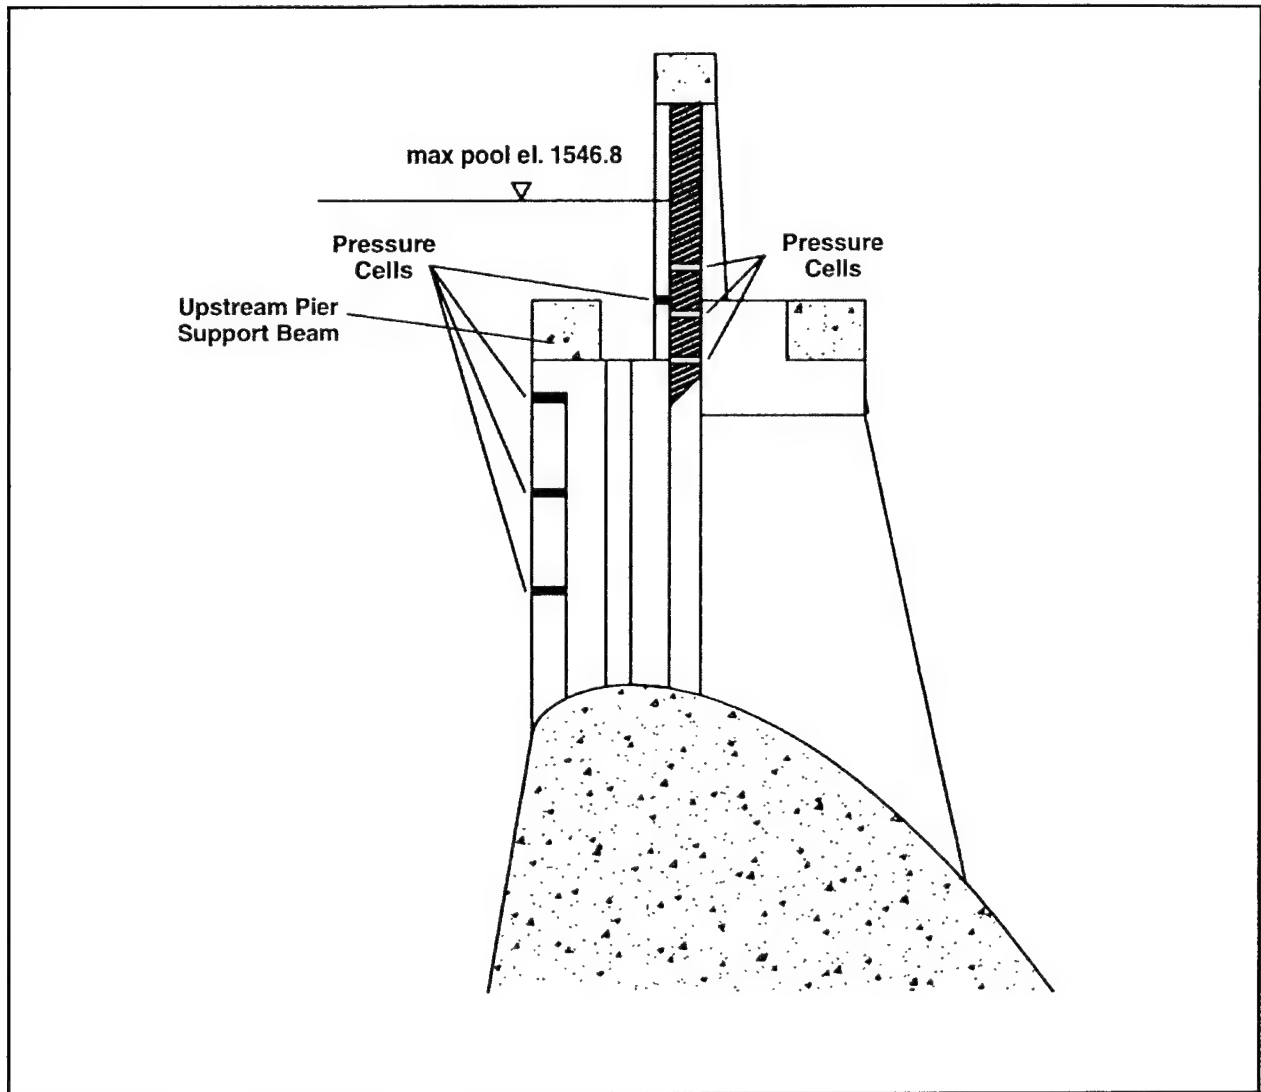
Cross section of spillway showing spill gate, pressure cell locations, and support beam
